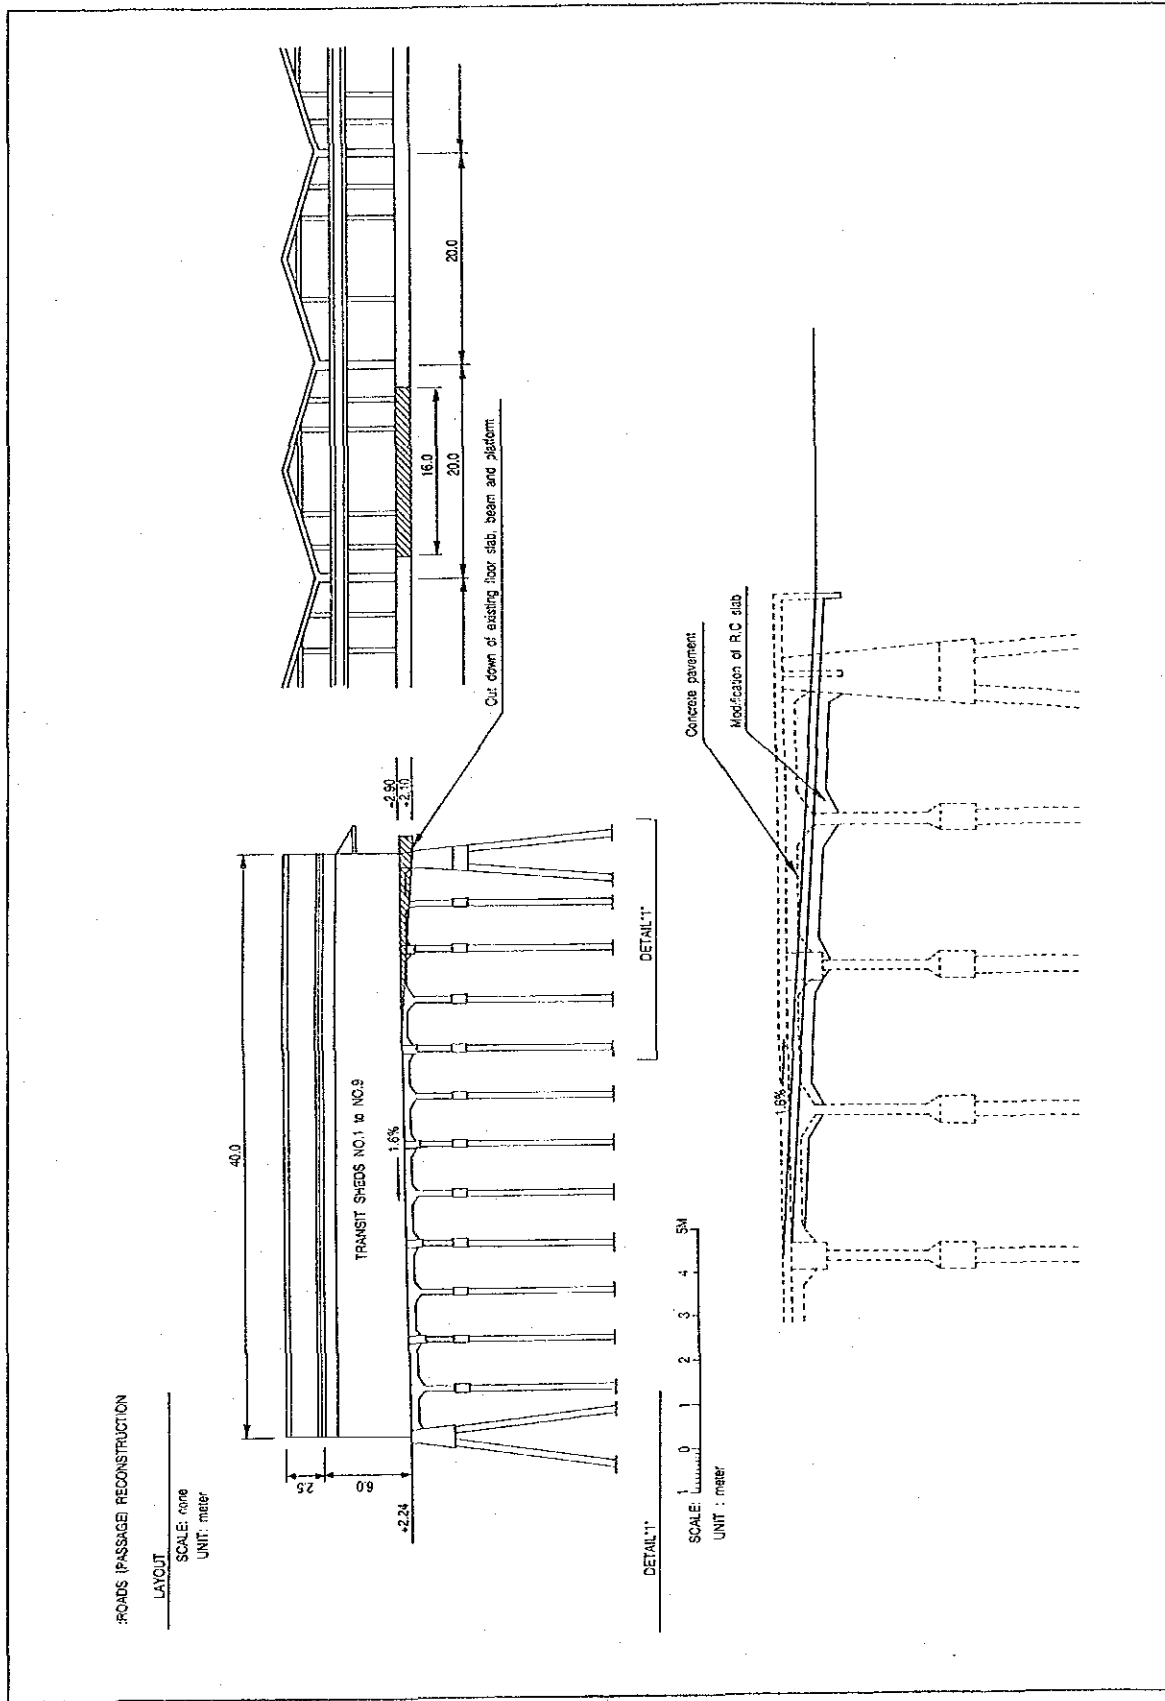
Modification Plan of Transit Shed No.1 ~ No.9
